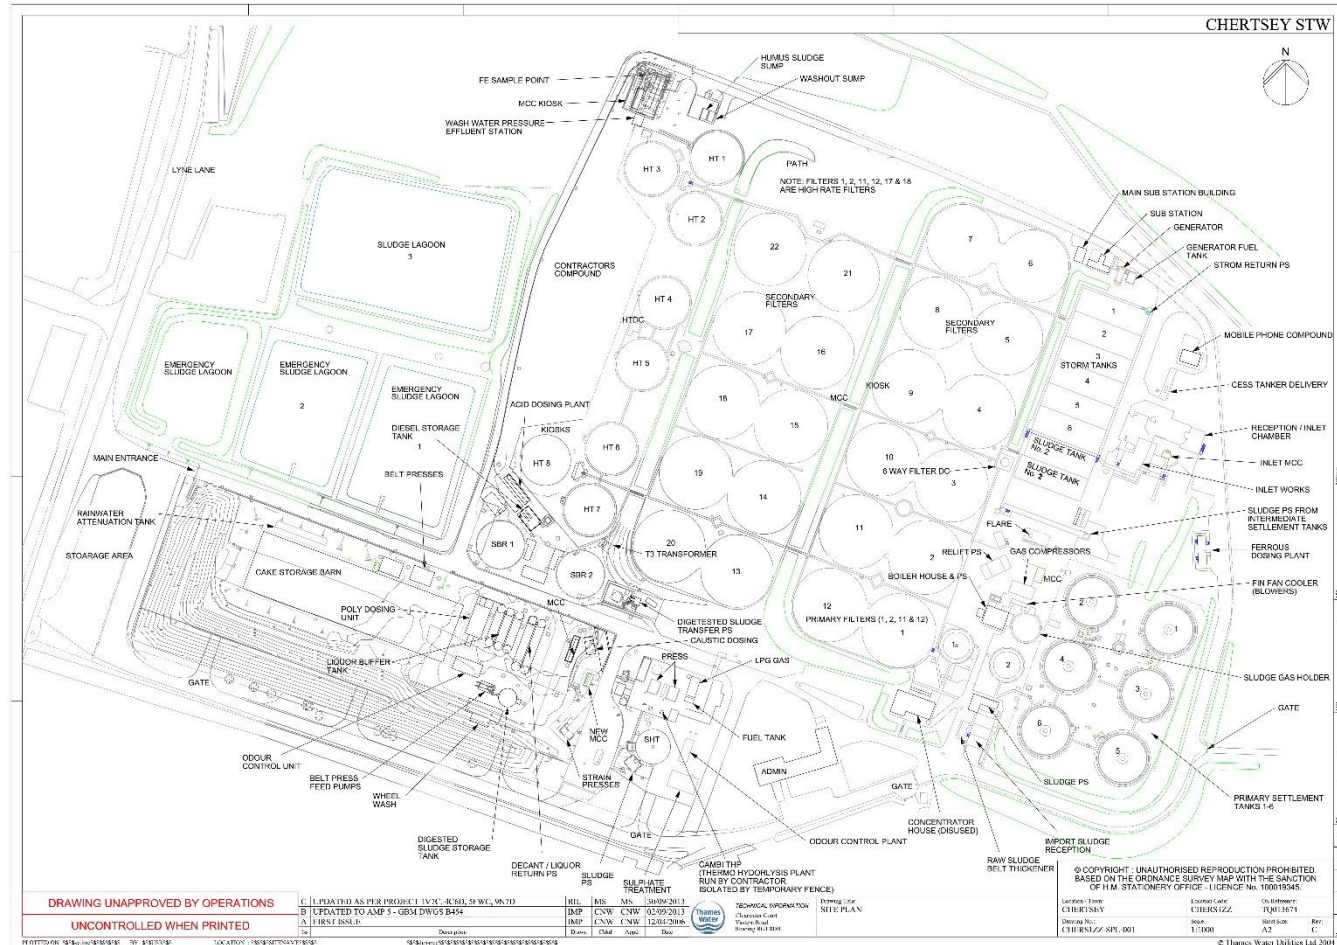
Figure C - Site Plan showing Sludge Treatment Centre Permitted Area
